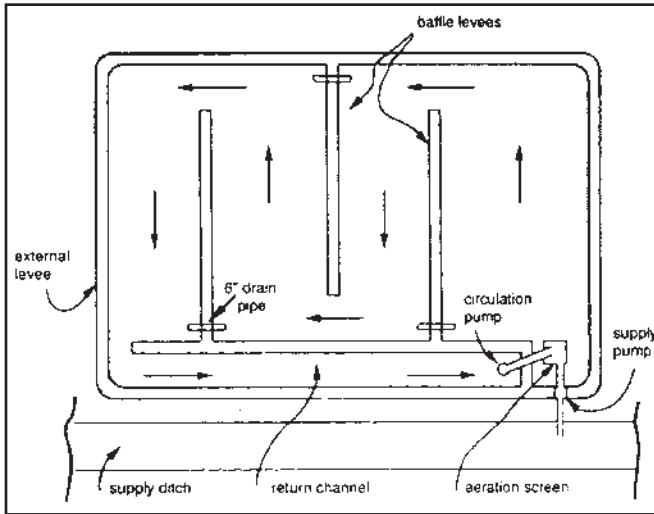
Construction plan for a crawfish pond showing a perimeter levee and baffle levees with recirculation capabilities.
